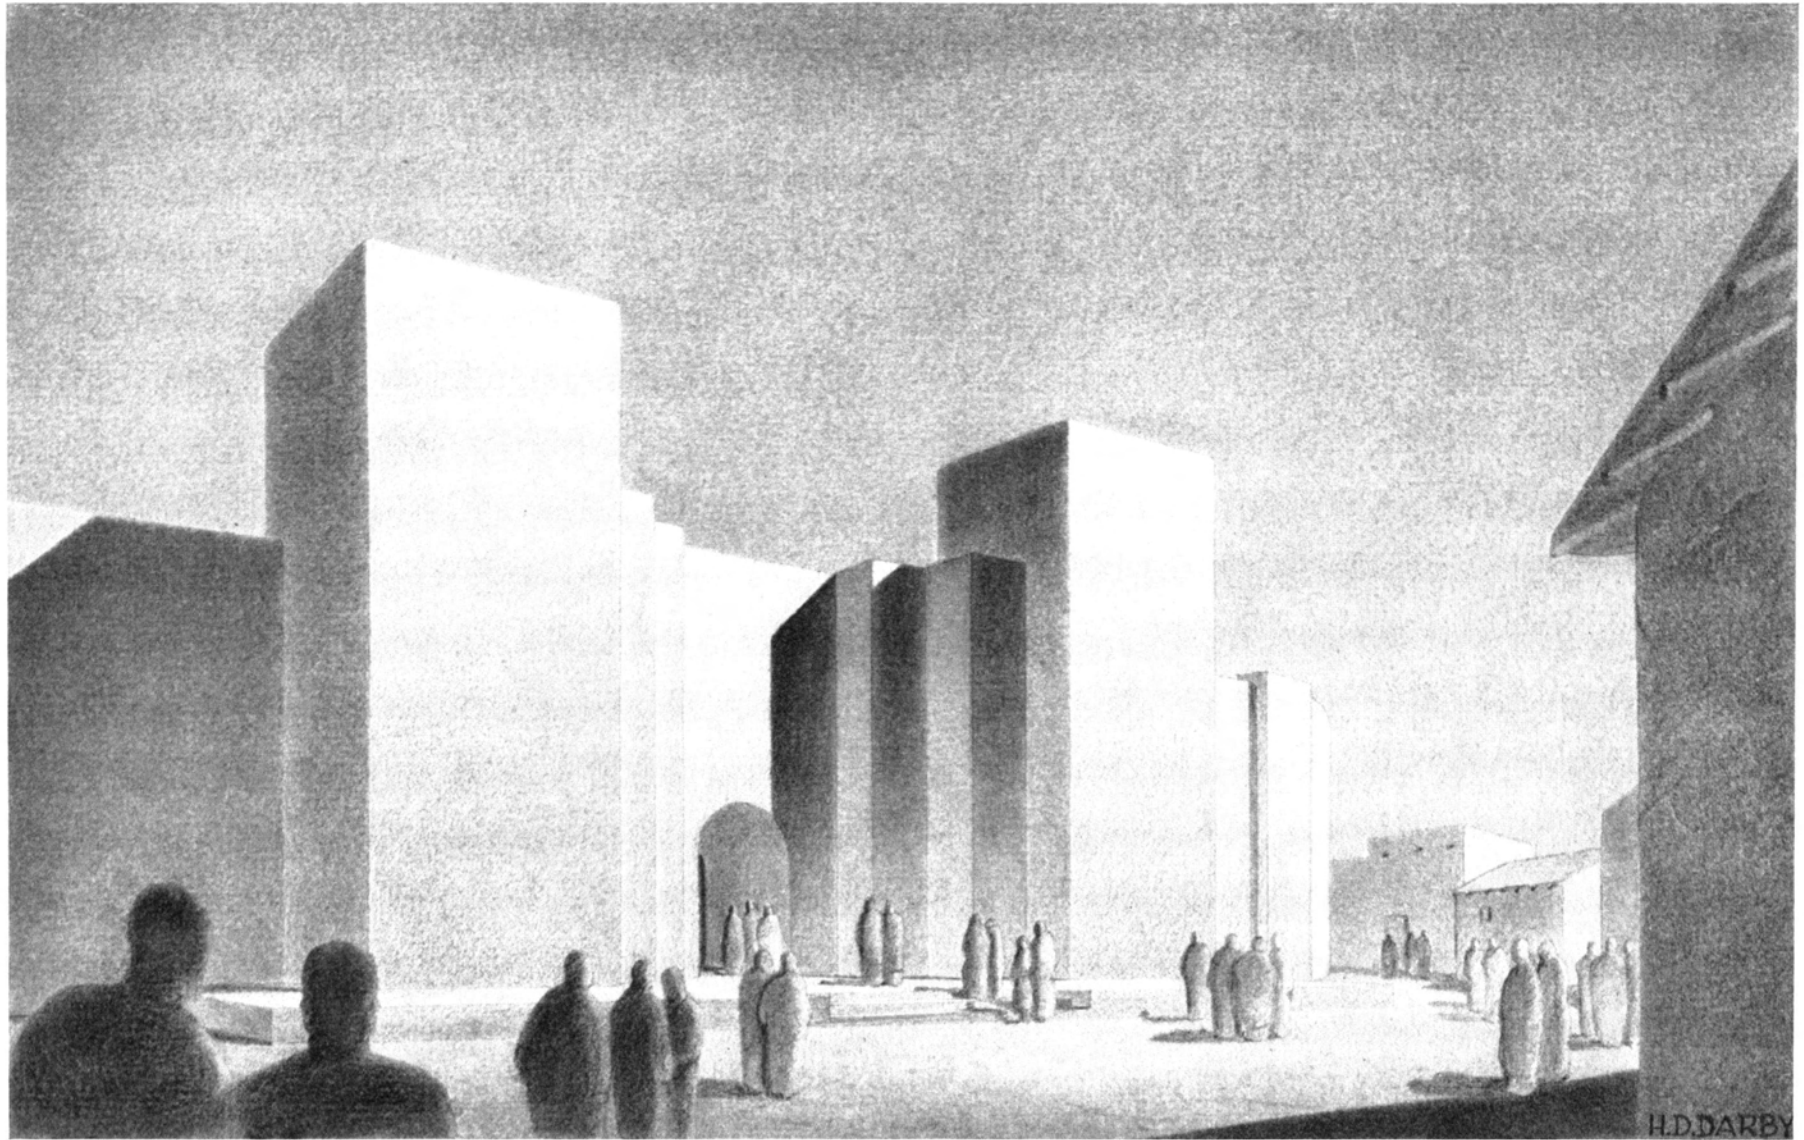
PERSPECTIVE FRONT ELEVATION OF THE GATEWAY OF THE THIRD BUILDING PERIOD, VIEWED FROM NORTHWEST
